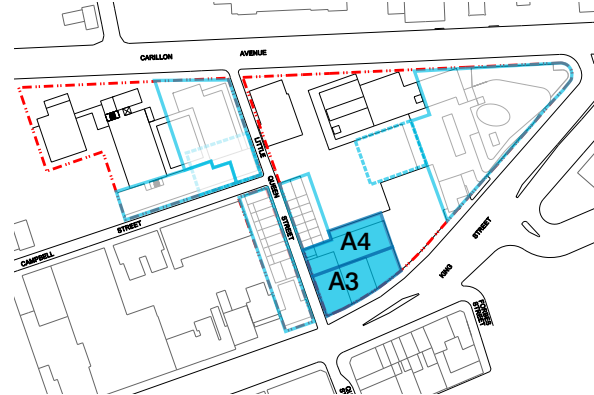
Stage 4 - King Street Retail & Teaching Centre
